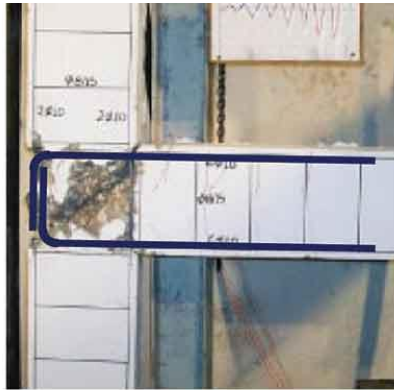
Typical failure modes for non-seismically designed beam-column joint
